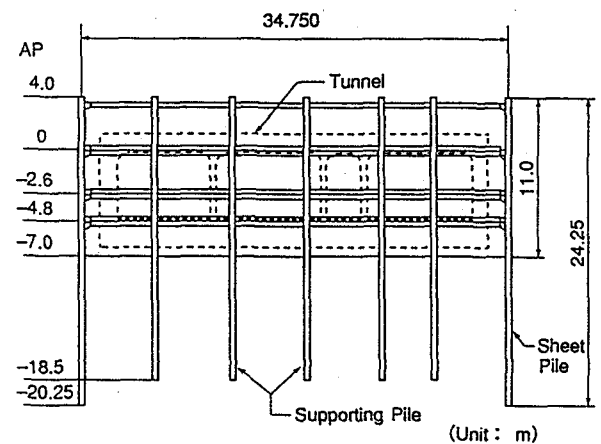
A Typical Cross Section Showing Bracing Method (Tanaka et al., 1989)
